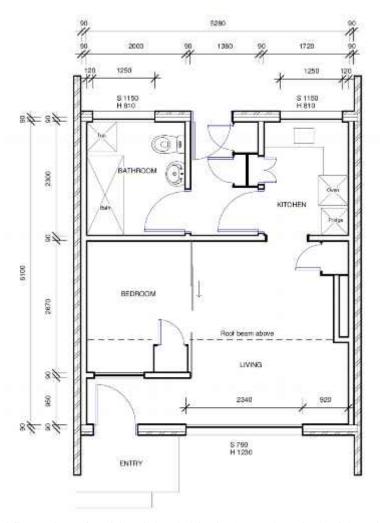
Partial floor plan of residential unit blocks (note that the bedsit units have a slightly different layout but are considered structurally identical).
